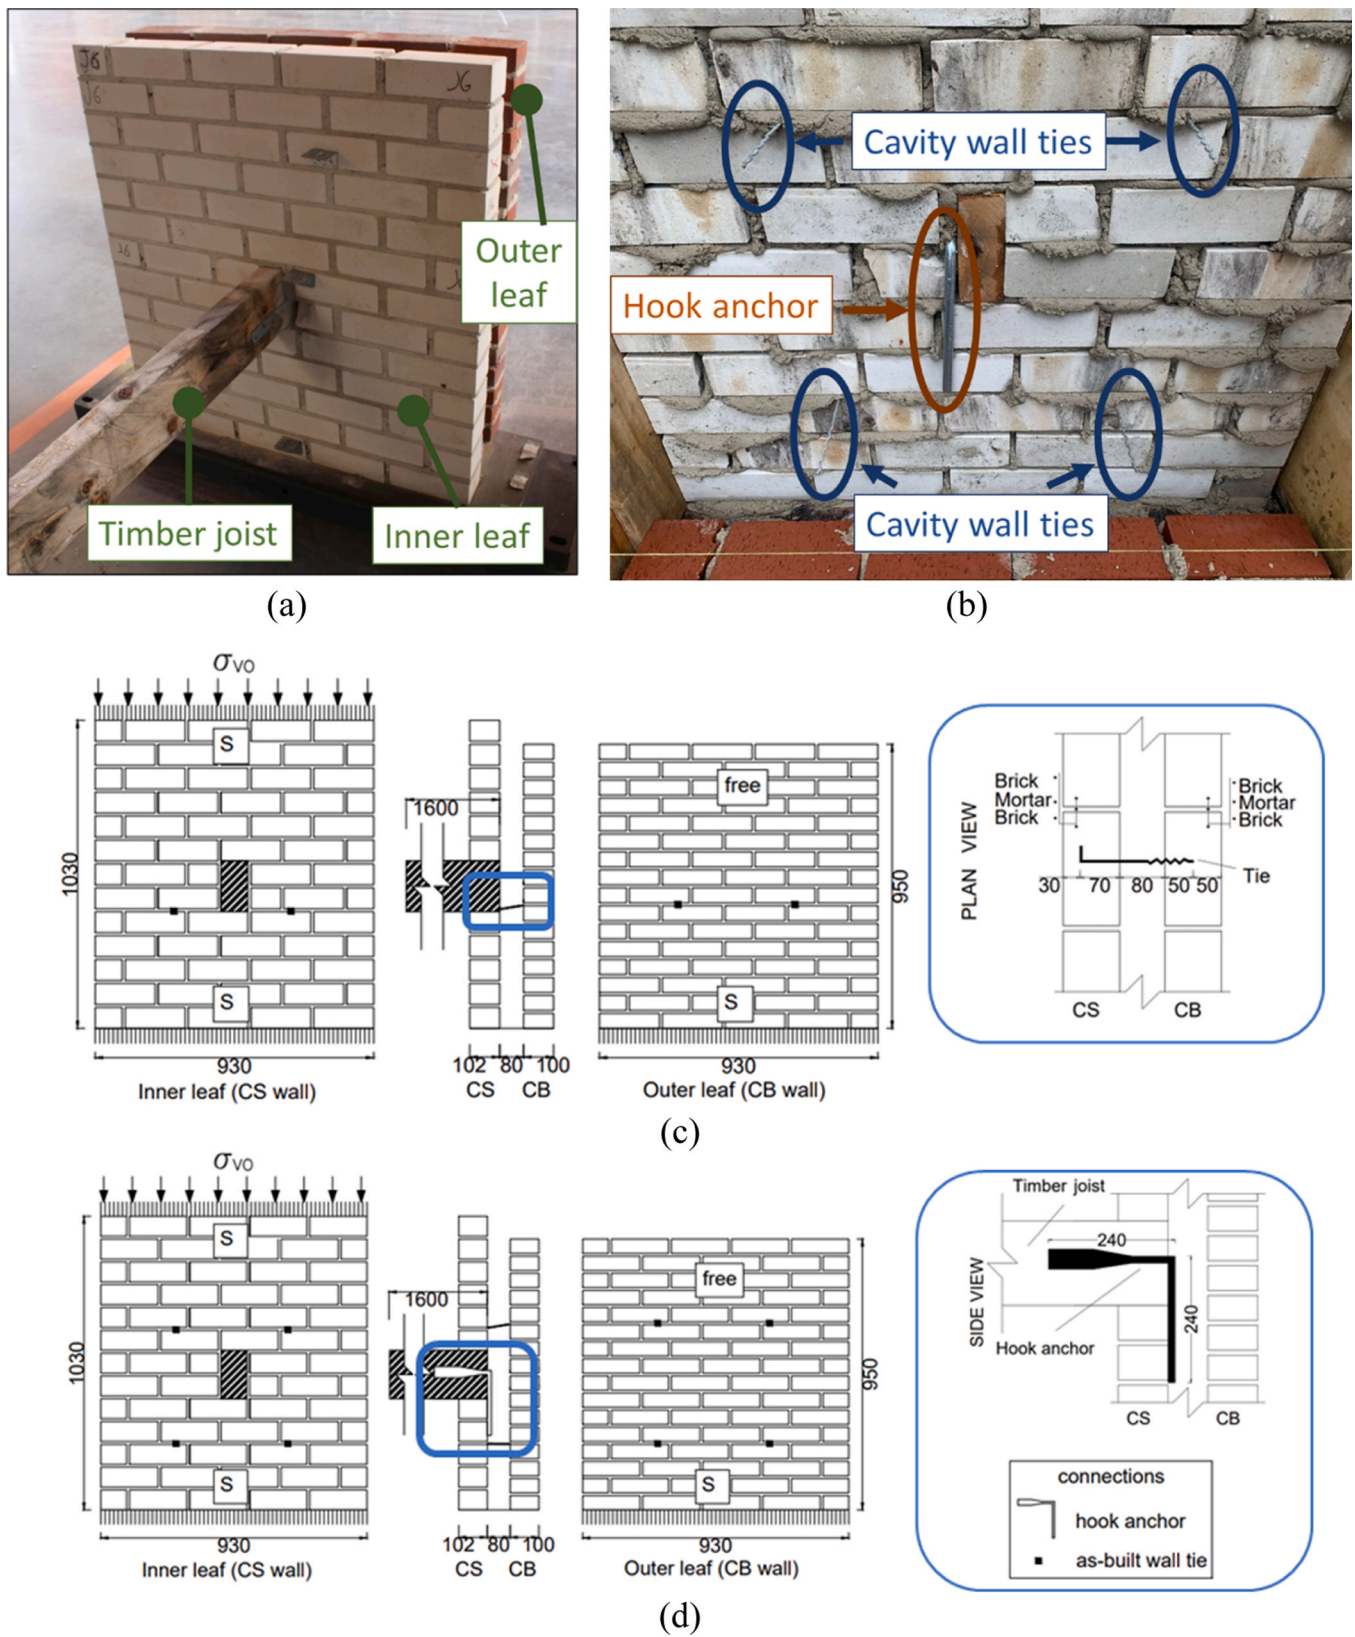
Geometry of the tested wallets and construction details: view of the cavity wall specimen with timber joist (a), view of the external side of the inner leaf of a cavity wall (b), the geometry of a specimen with two as-built cavity wall ties and details of cavity wall tie connection (c) and the geometry of a specimen with four as-built cavity wall ties and details of hook anchor connection (d) (dimensions are in mm). Note that S is simply-supported edge and Free is free edge.
